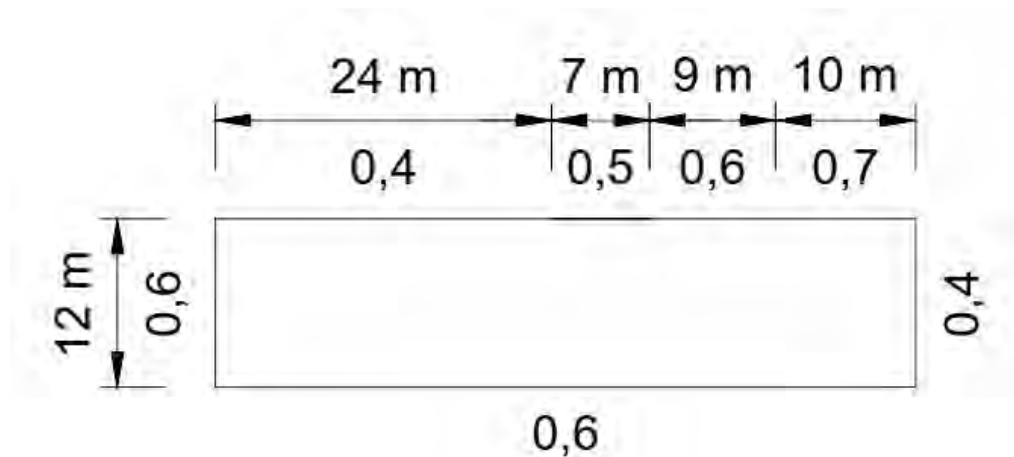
The dimensions of studied building and the obstruction factor, see section 4.3, based on the suburban street plan presented at Figure 3.
